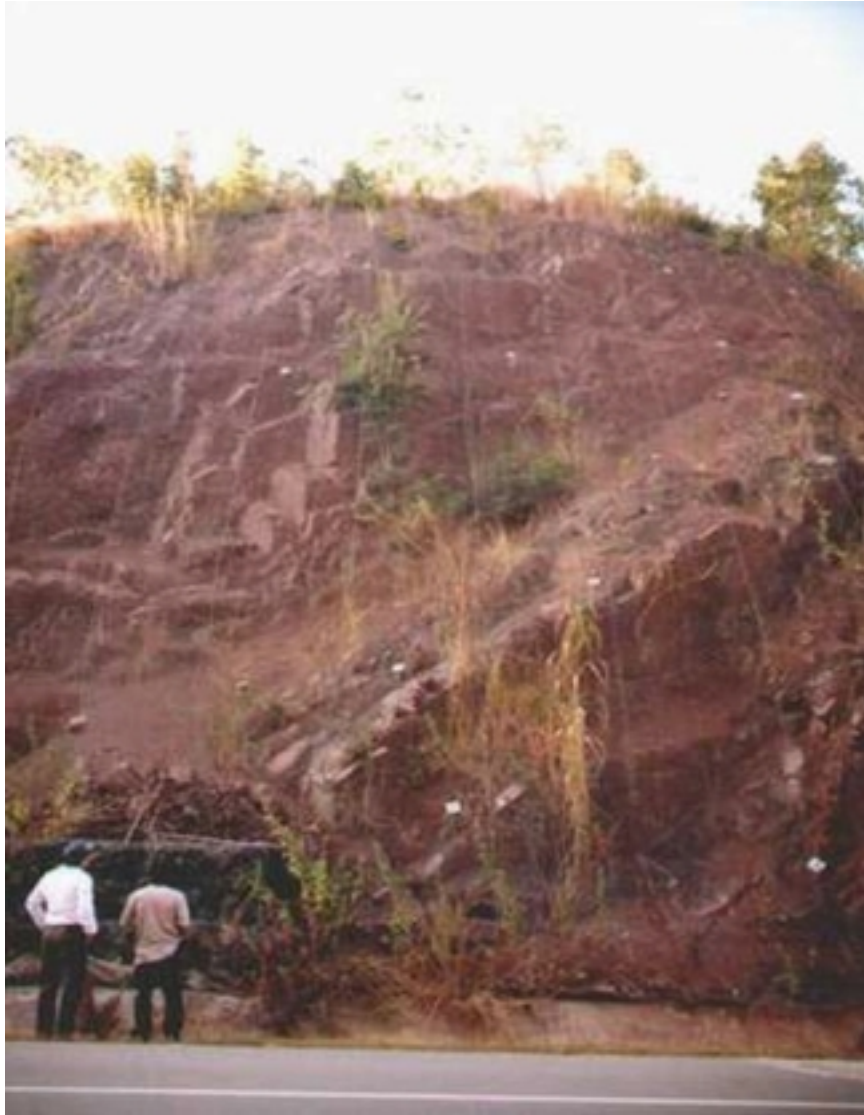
Rock slope at km 21+225 (looking northeast). Massive slope failure occurred after the installation of shotcrete. Failure surface cut from the upper slope through the mid-height of the slope face.
